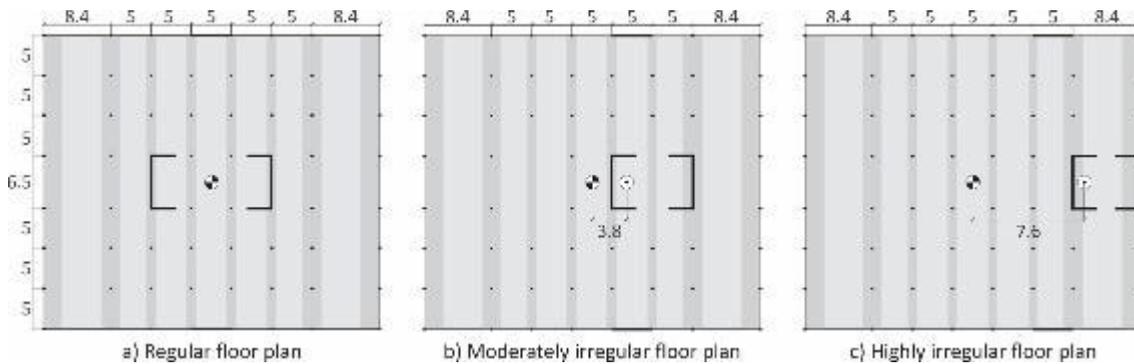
Floor plan schematic drawings of the building models. Note: all measurements are in metres
